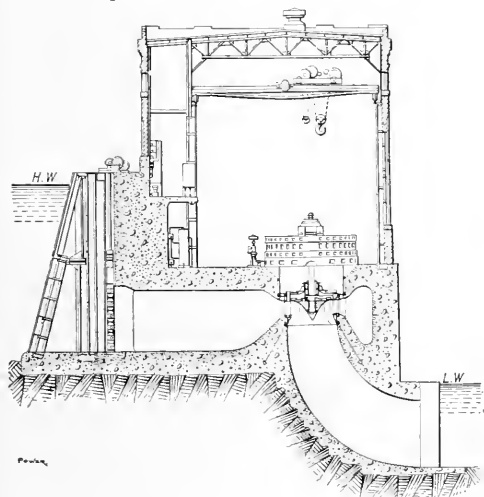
CROSS-SECTION OF POWER HOUSE NO. 4. SHOWING TURBINE AND GENERATOR
